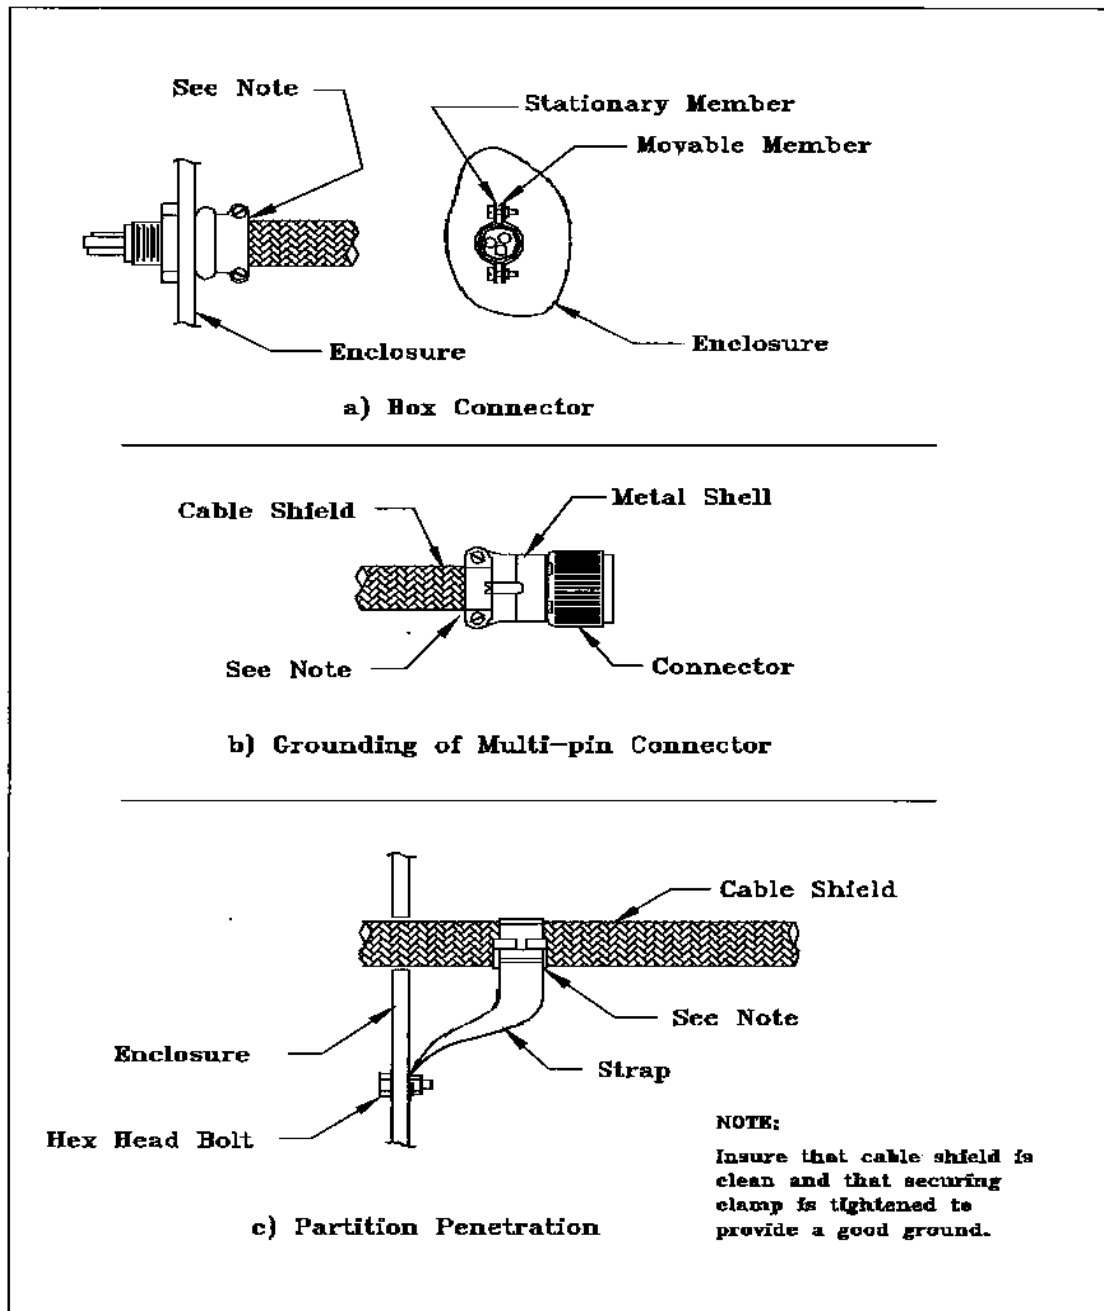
Figure III. Grounding of Overall Cable Shields to Connectors and Penetrating Walls
